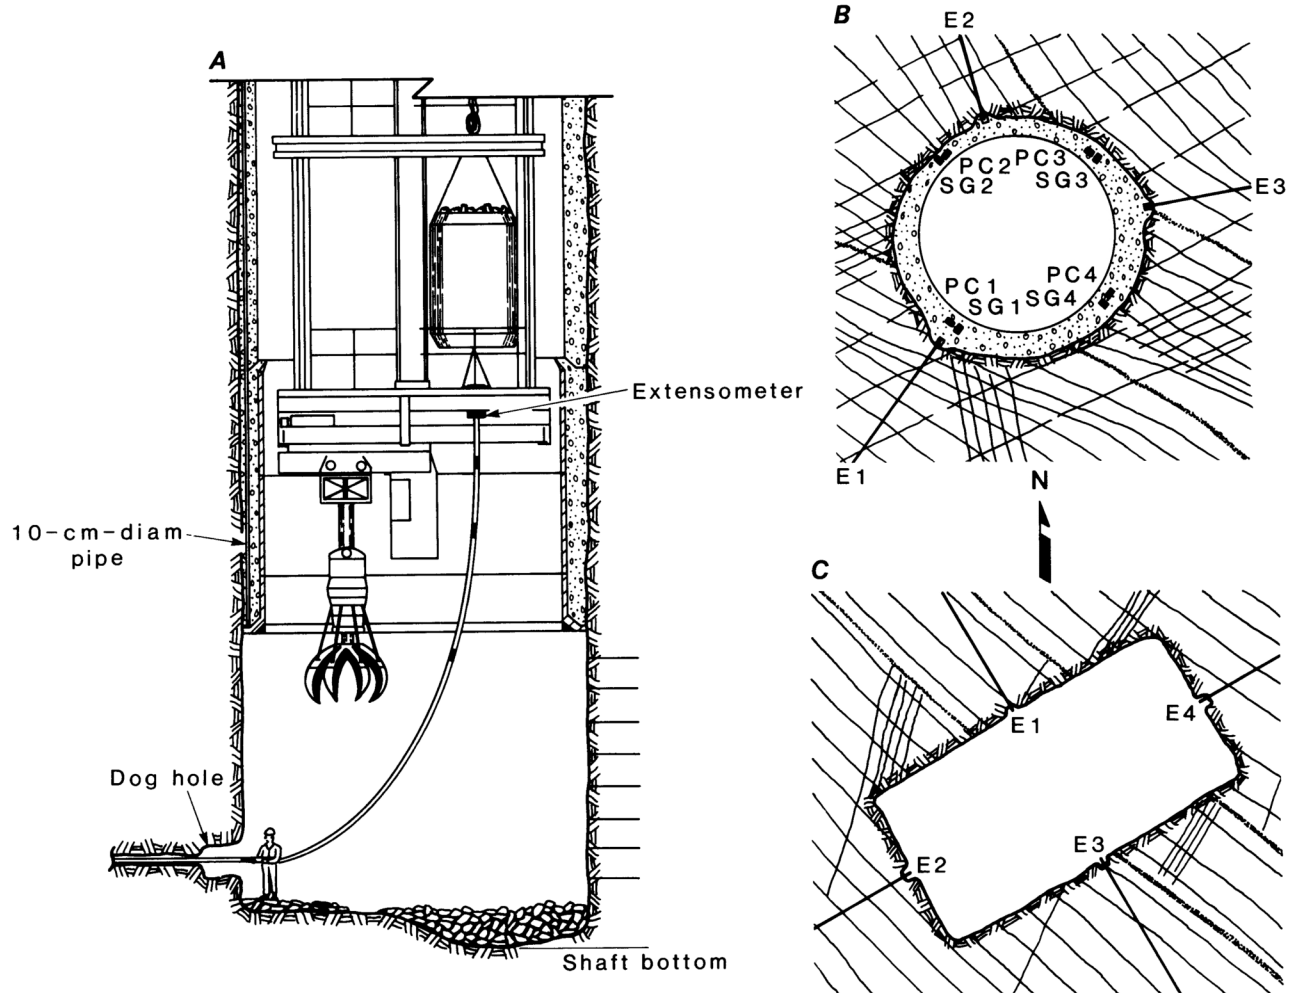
Typical Installation of MPBX in shaft. (A) Vertical section, (B) plan view of circular configuration, and (C) plan view of rectangular configuration.
